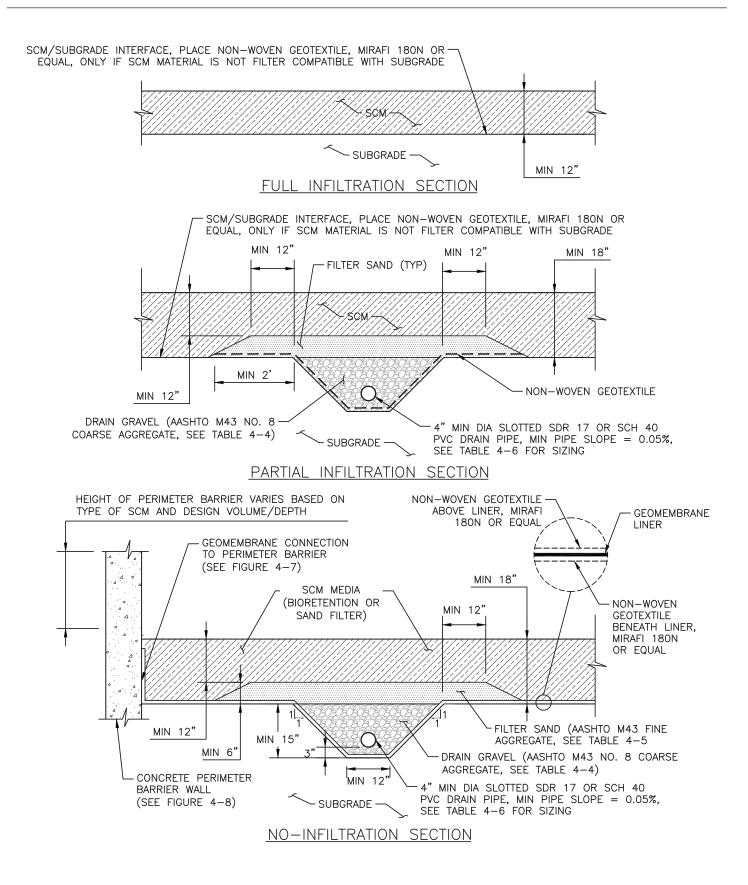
CONCEPTUAL CROSS SECTIONS FOR FULL, PARTIAL, AND NO INFILTRATION SYSTEMS SECTION VIEW (NOT TO SCALE)
